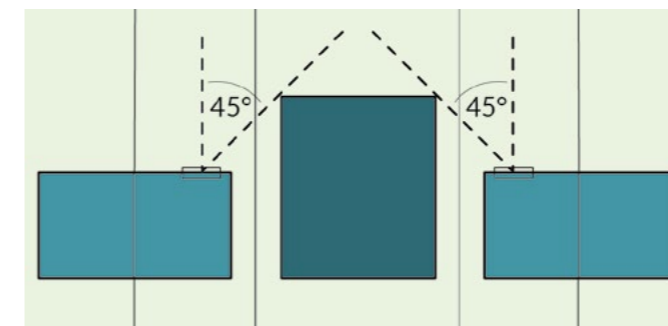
Massing of new developments that extend beyond the building line should not obstruct a line drawn at a 45° angle from the horizontal centre of the habitable room window closest to the boundary.
